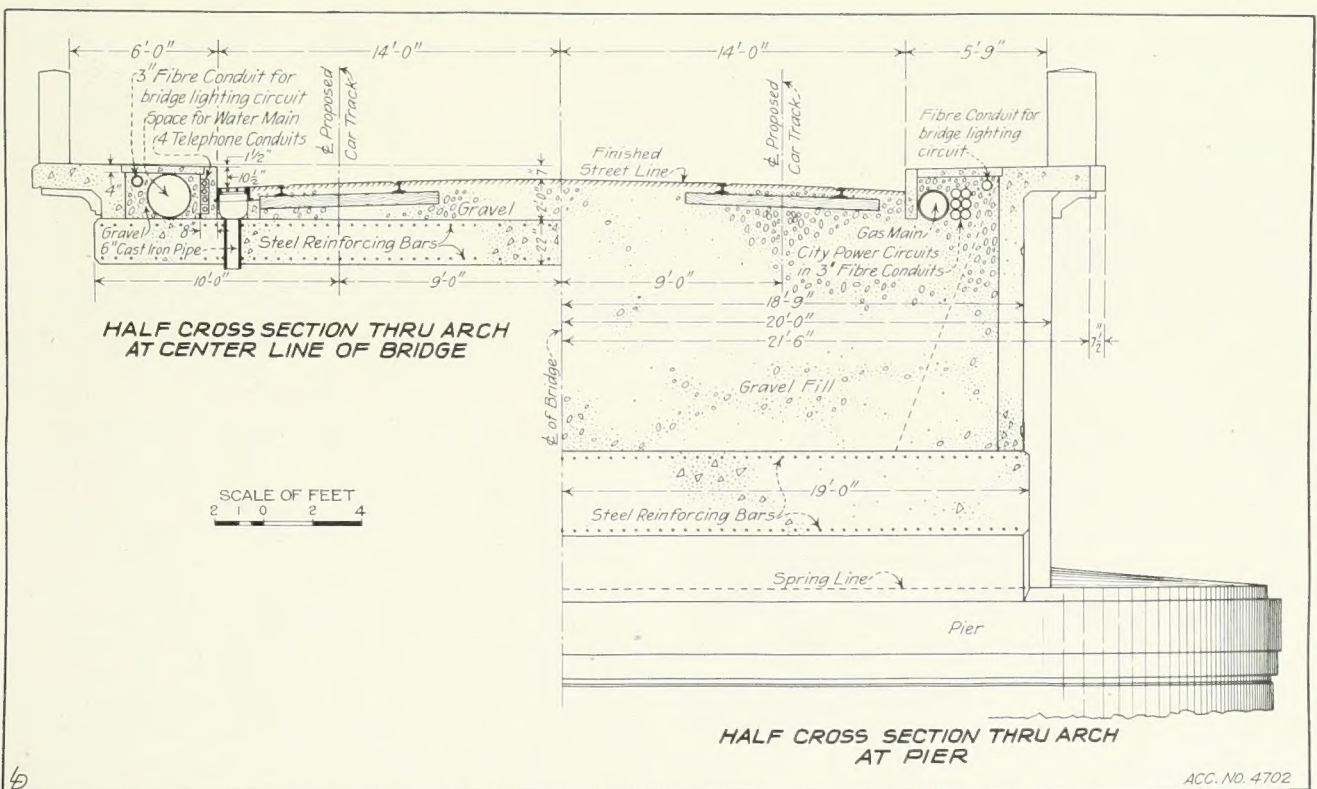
DRAWING SHOWING SOME DETAILS AND DIMENSIONS OF THE BLACK STREET BRIDGE.
